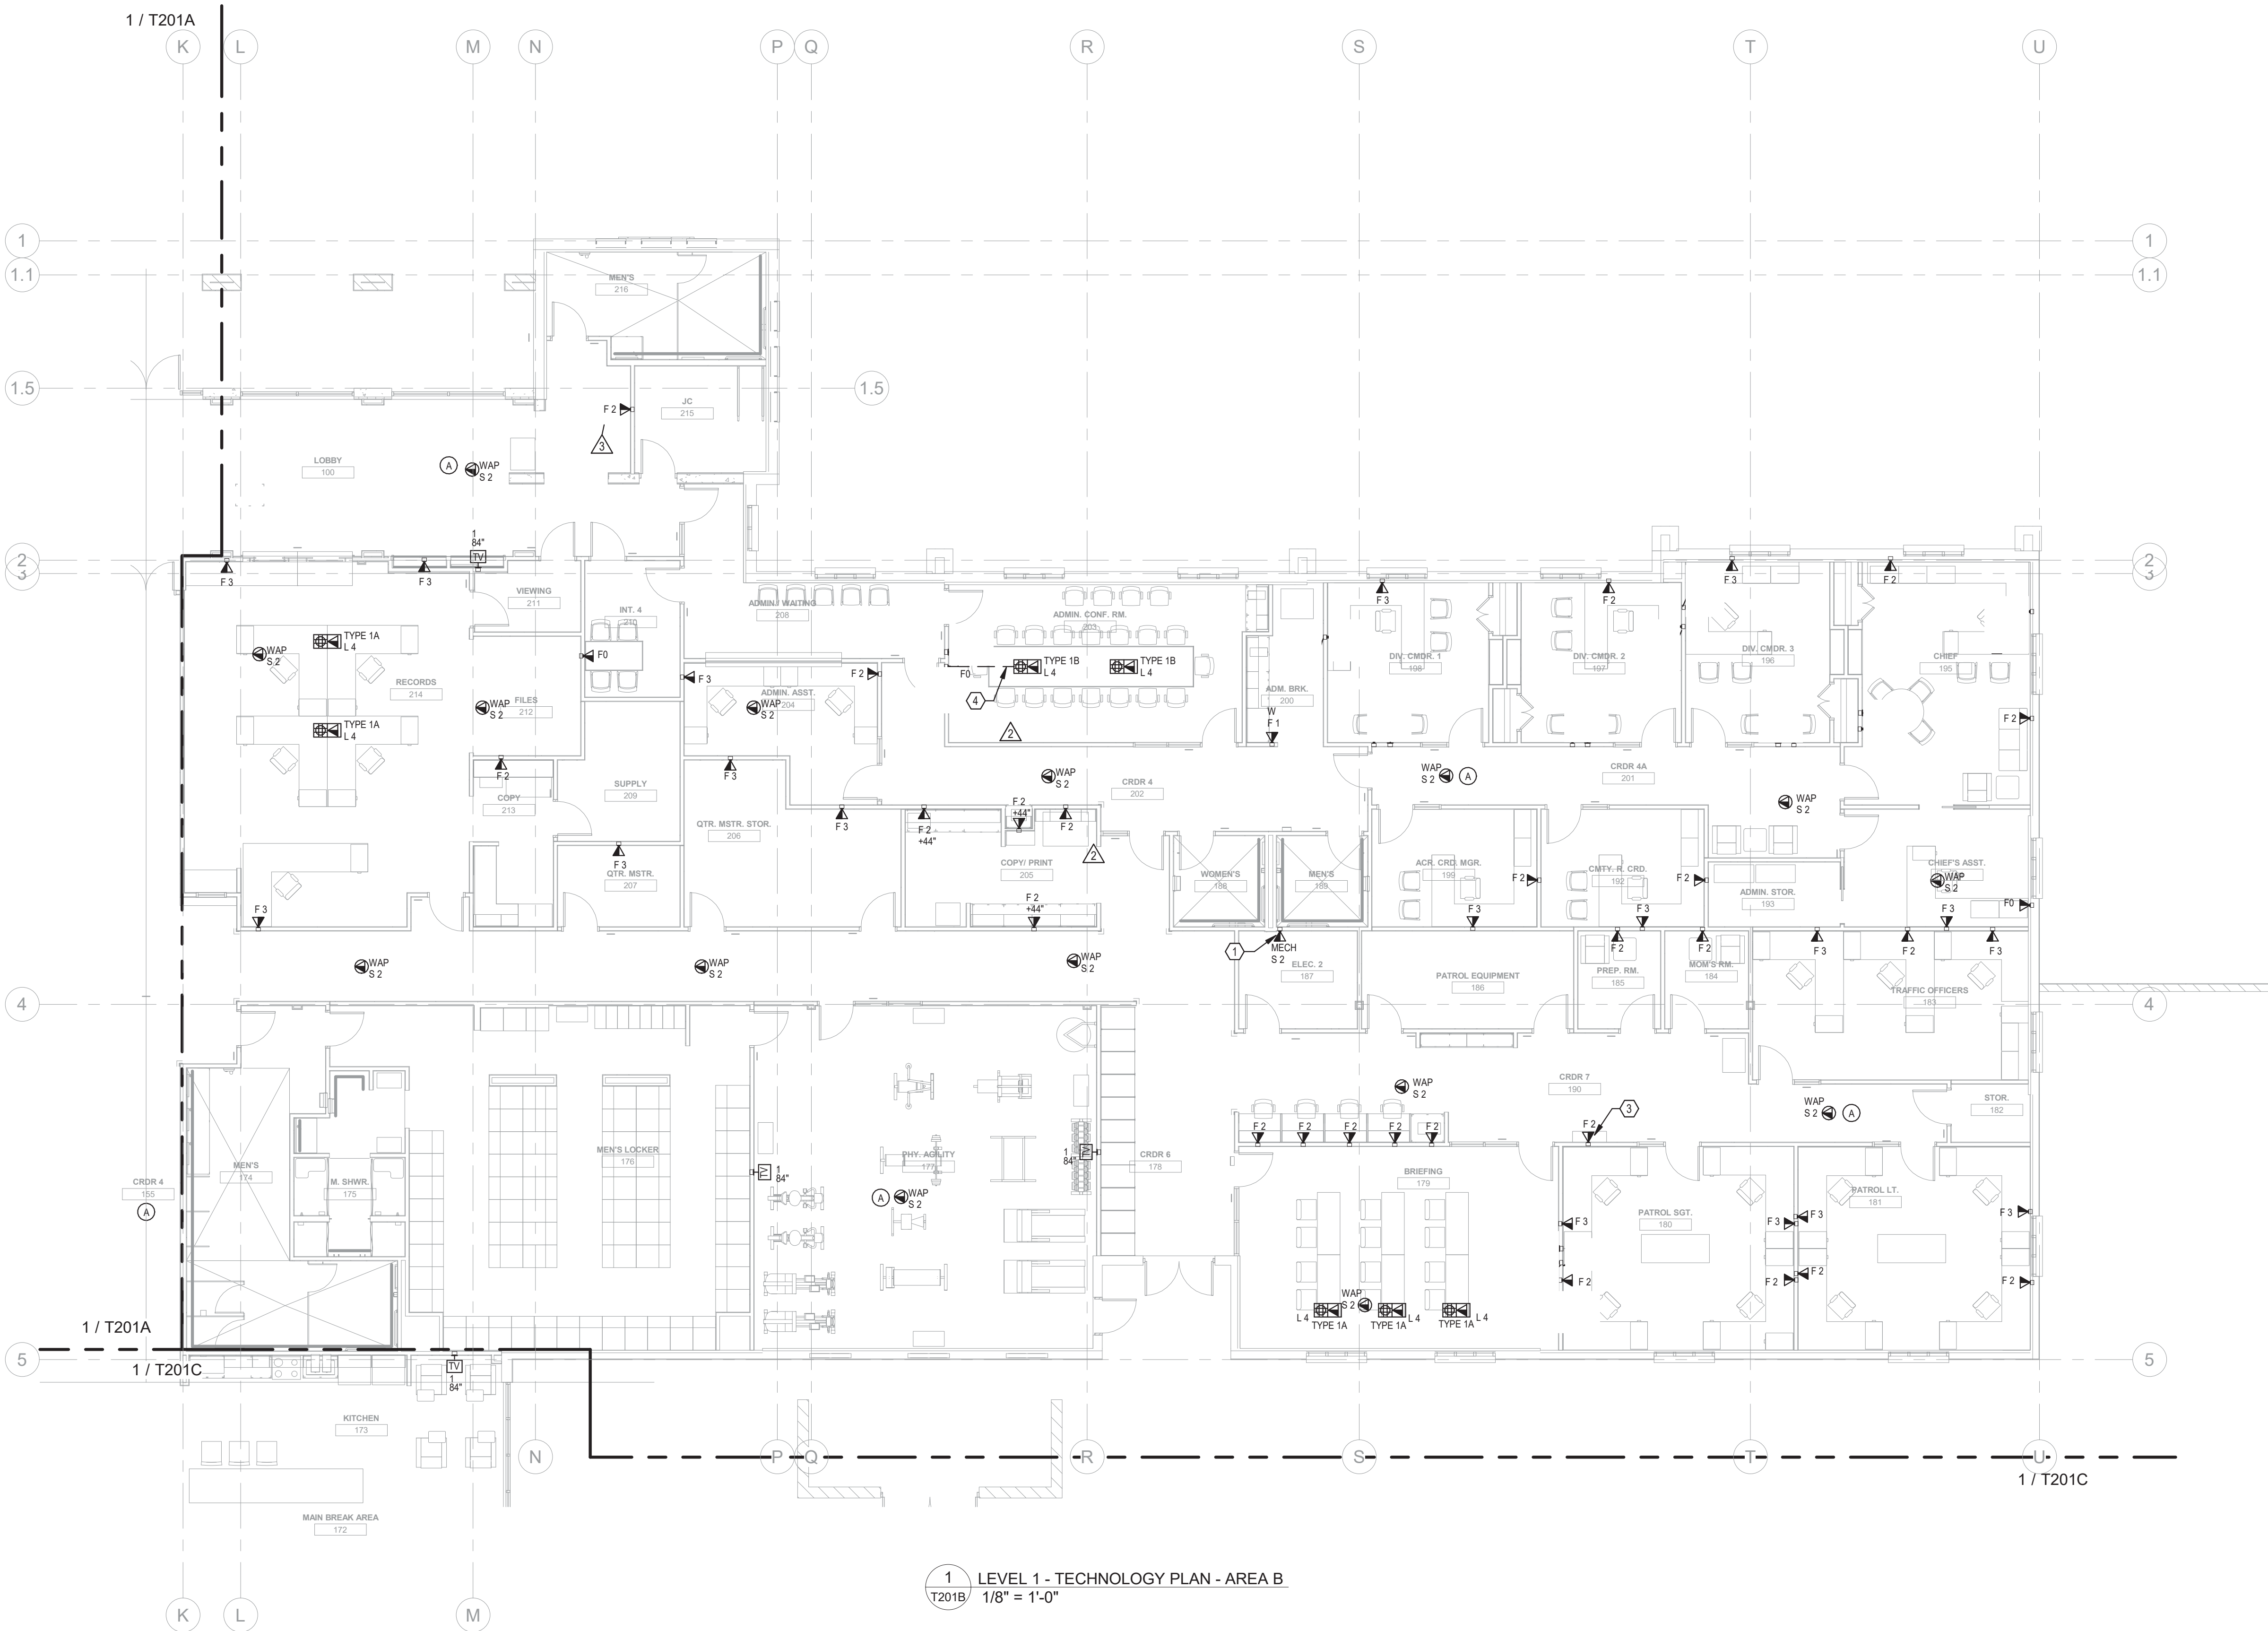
EXHIBIT A AVS & TECHNOLOGY PLANS & DETAILS
